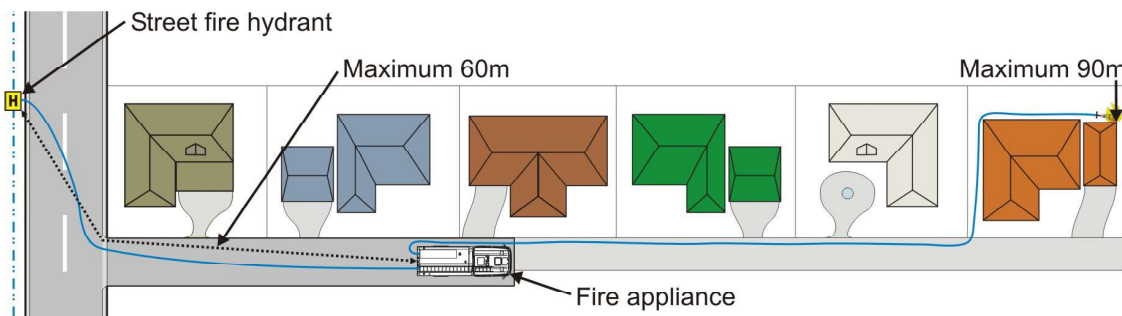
Example of street fire hydrant used by fire appliance on private carriageway
